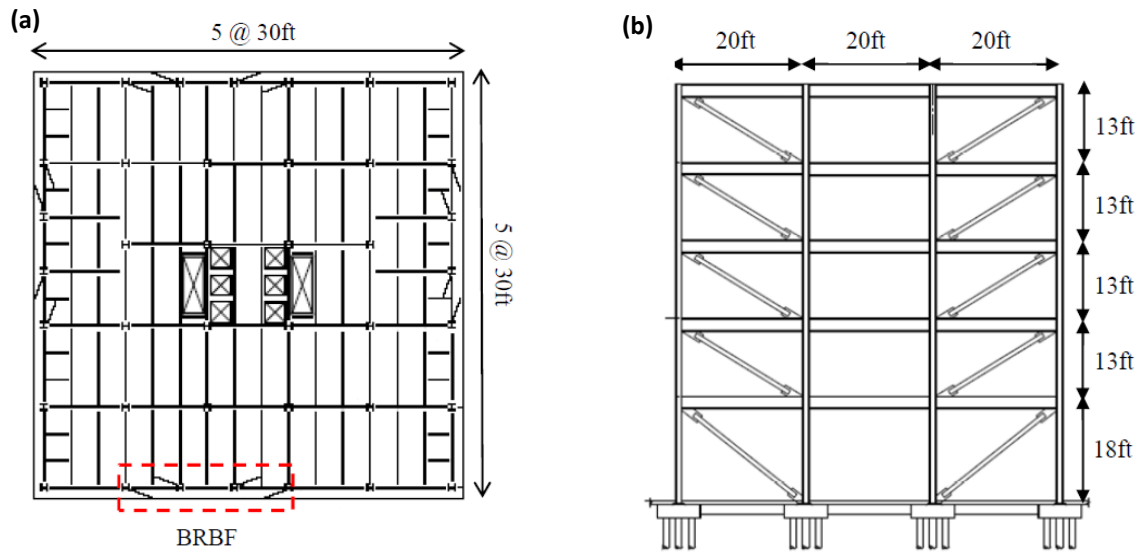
(a) Plan and (b) Elevation Views of BRBF Used for Hybrid Frame Analyses
